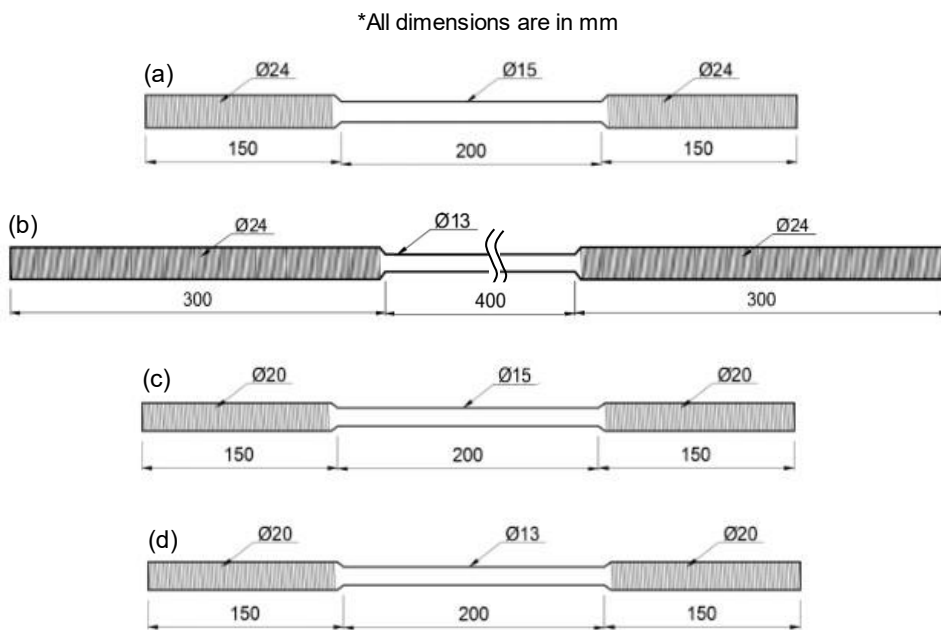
Geometry of anchor rods used: in (a) Specimen-4; (b) Specimen-5; (c) Specimen-6; (d) Specimen-7
